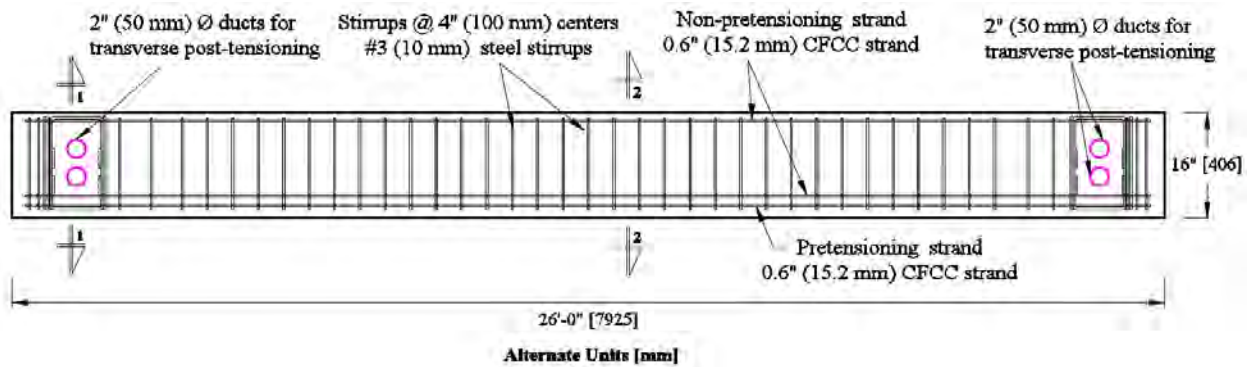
Longitudinal section of prestressed decked bulb T beam
